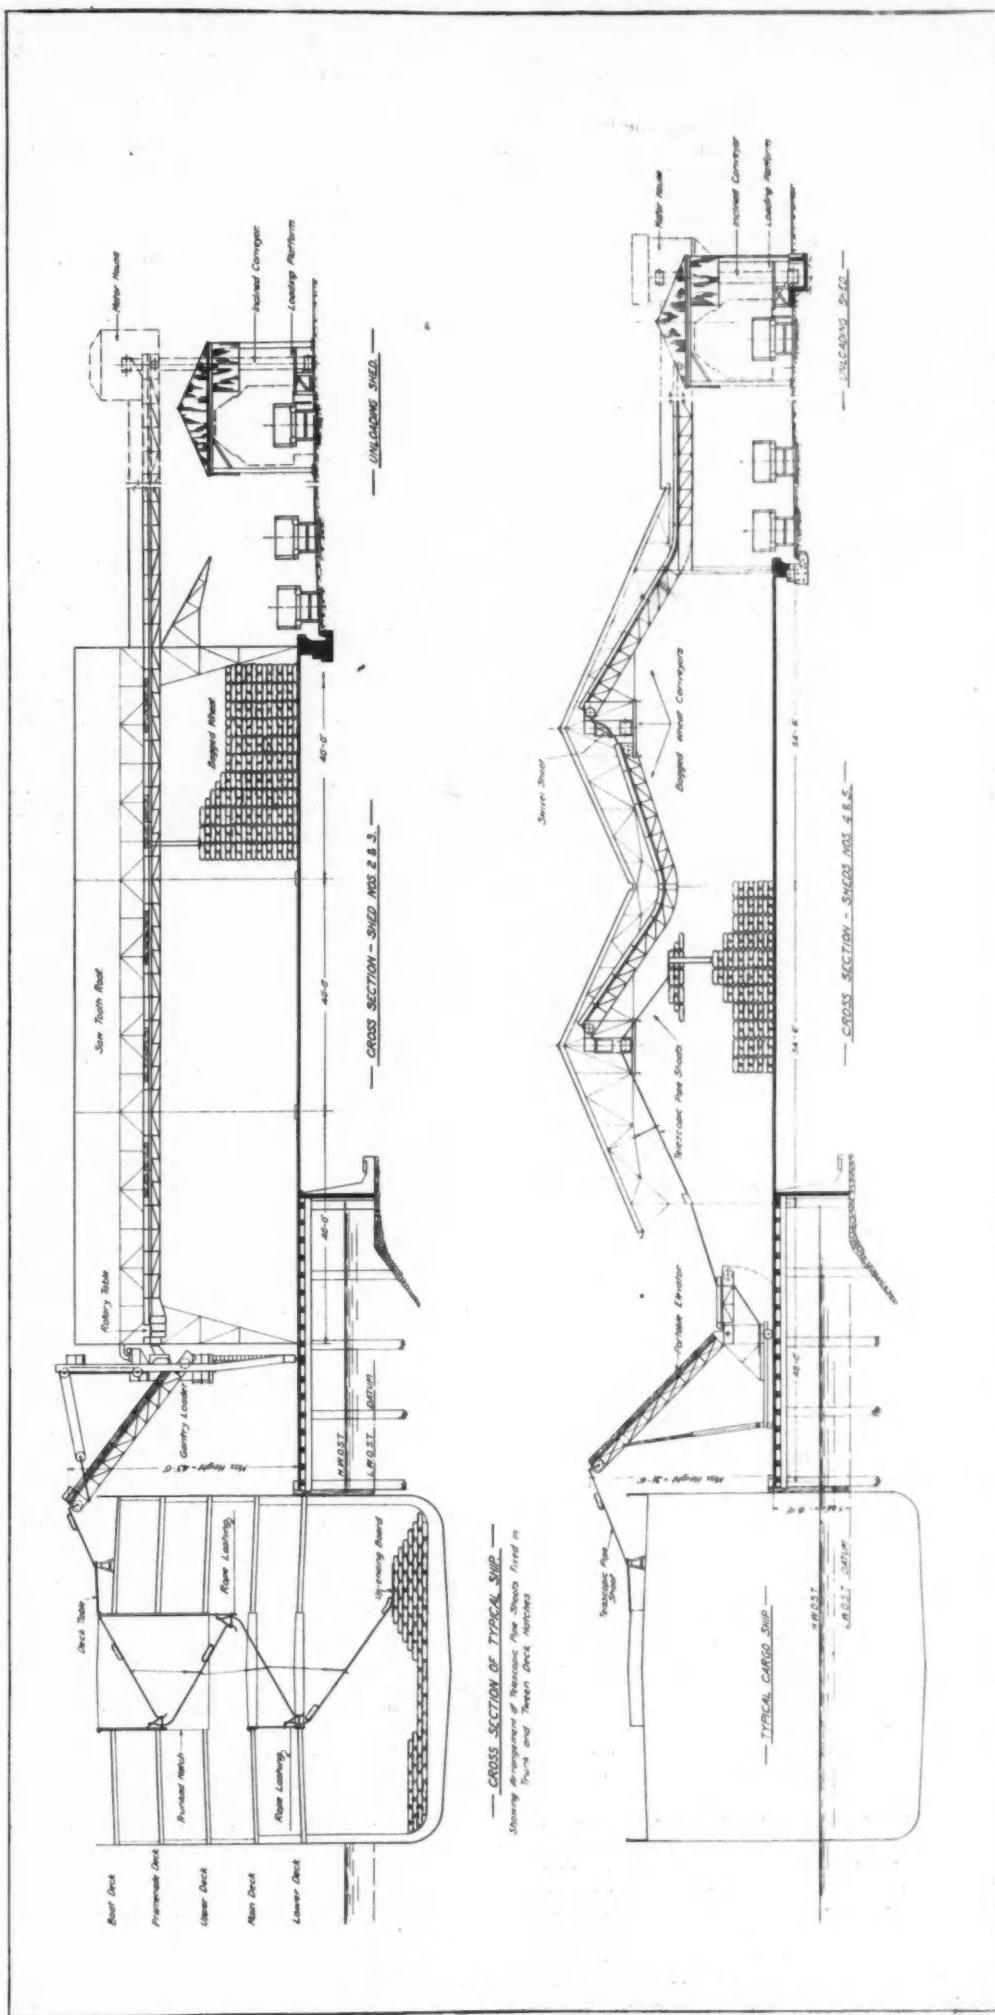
Sectional Elevations through Wheat Sheds, Glebe Island.
